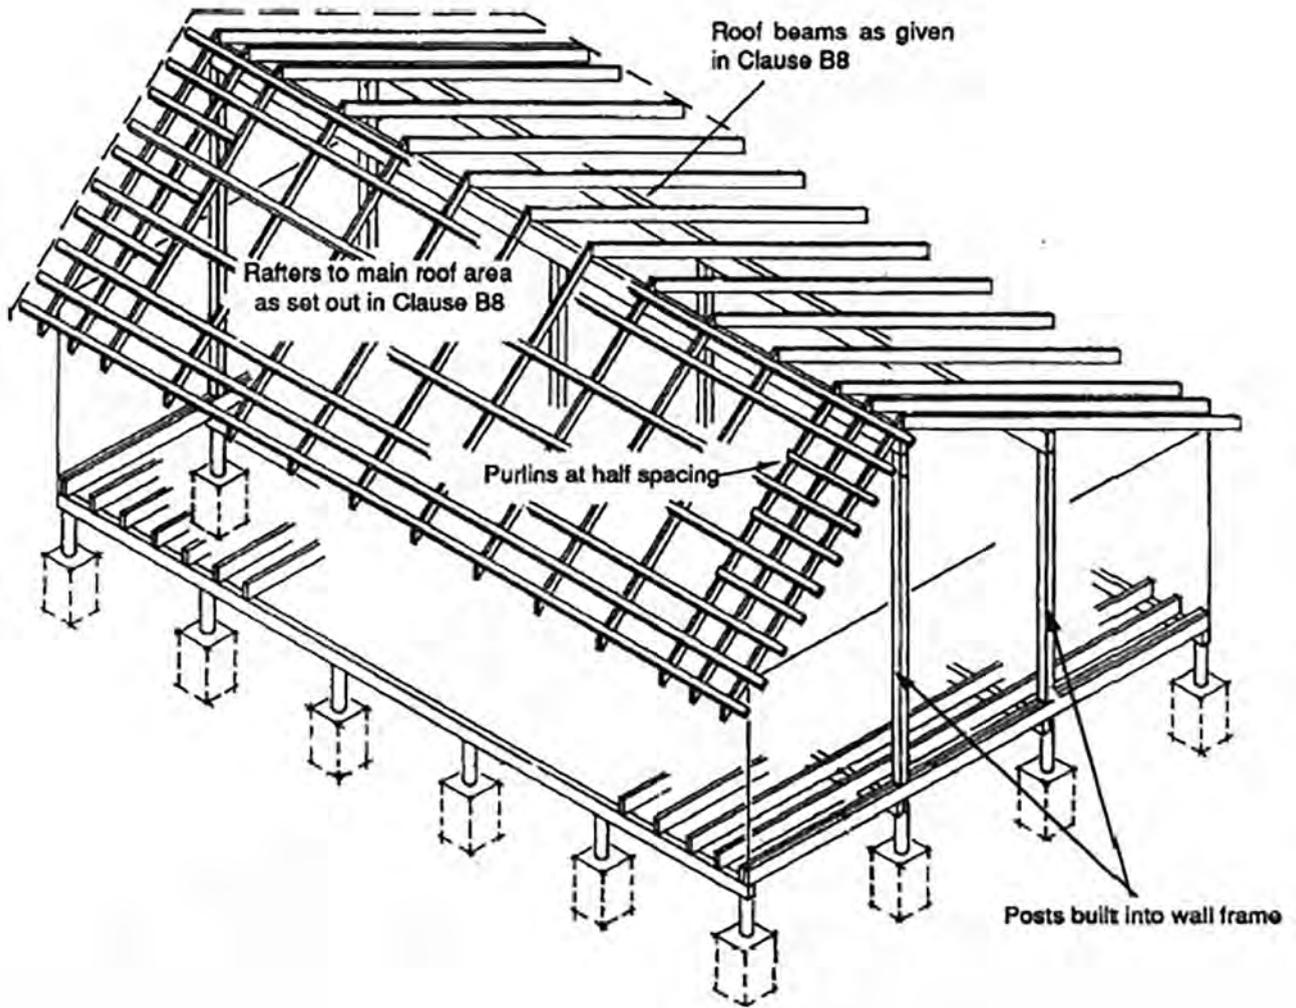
RAFTER ROOF FRAMING DETAILS
